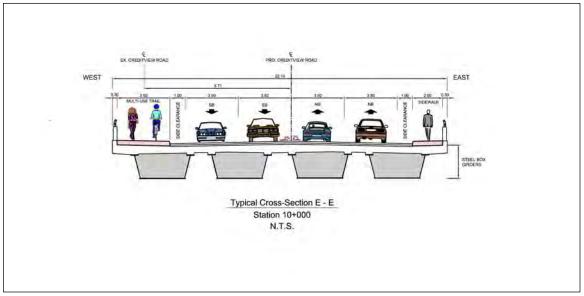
Creditview Road Class EA, Preliminary Preferred Alternative: Typical Cross-Section E-E at Station 10+000 [AECOM, 2015].
